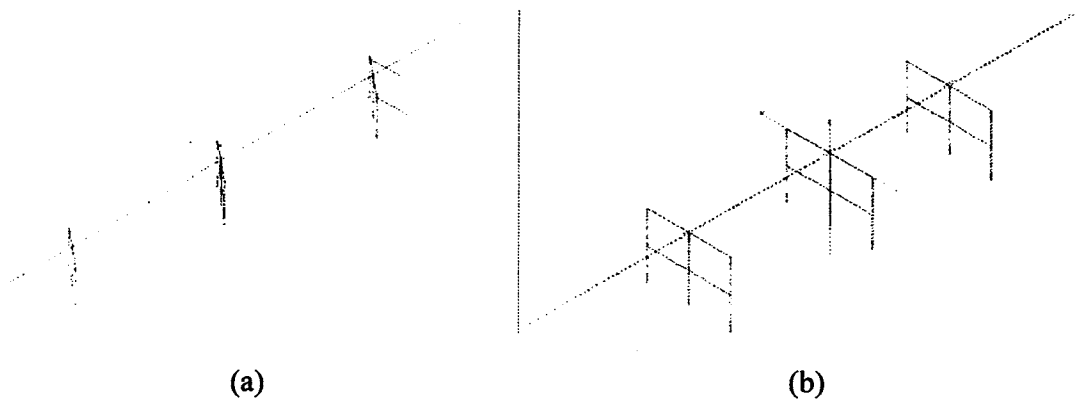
(a) Friction and Viscous Damper Layout for Bridge 5/826 (b) Link Beam Layout for Bridge 5/227
